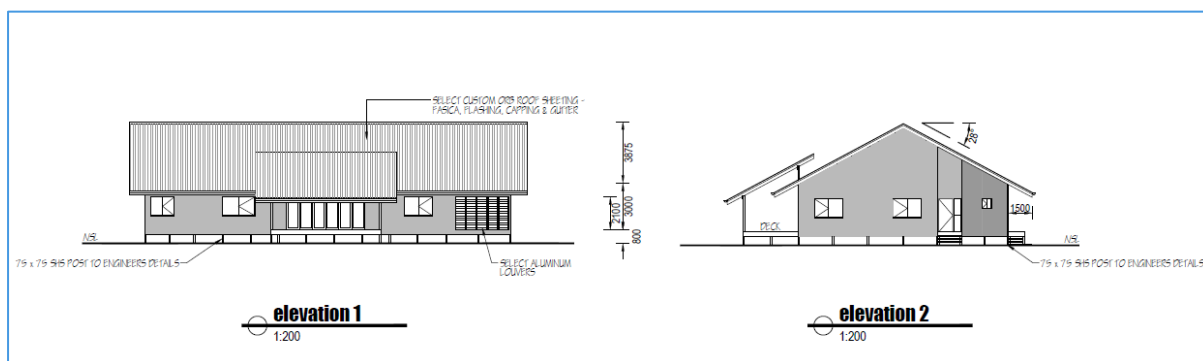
DEVELOPMENT CONCEPT – ELEVATIONS
